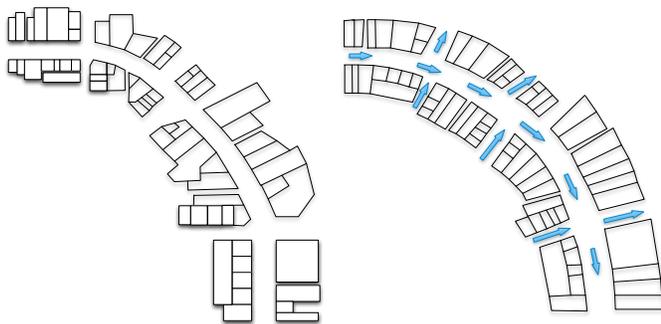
Shopping mall floorplan case study. Left side is the original floorplan and right side is the learned one.
